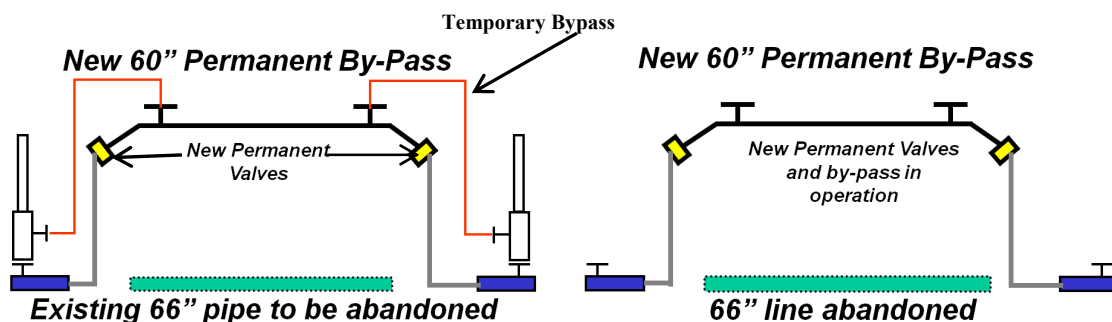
Scheme to bypass existing pipe Figure 16 Replacement pipe in service plugging complete
